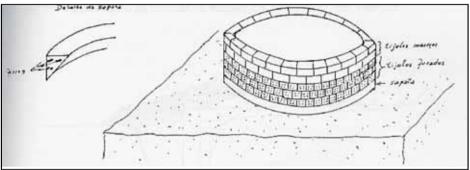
Construction of Brick Piezometric Well Source: Costa Duarte (1998).
